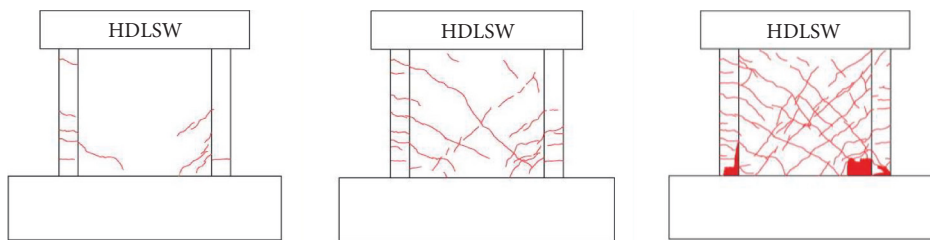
Crack development of the shear wall HDLSW.
